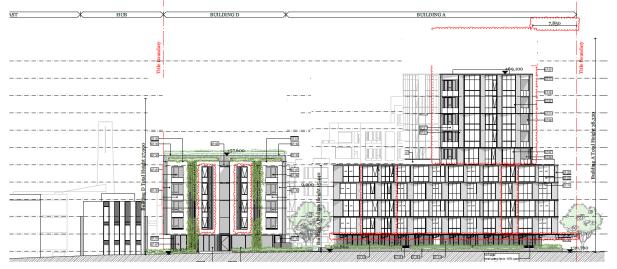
Recommended Northern elevation of Buildings A and D reduced to 10 and 6 storeys
